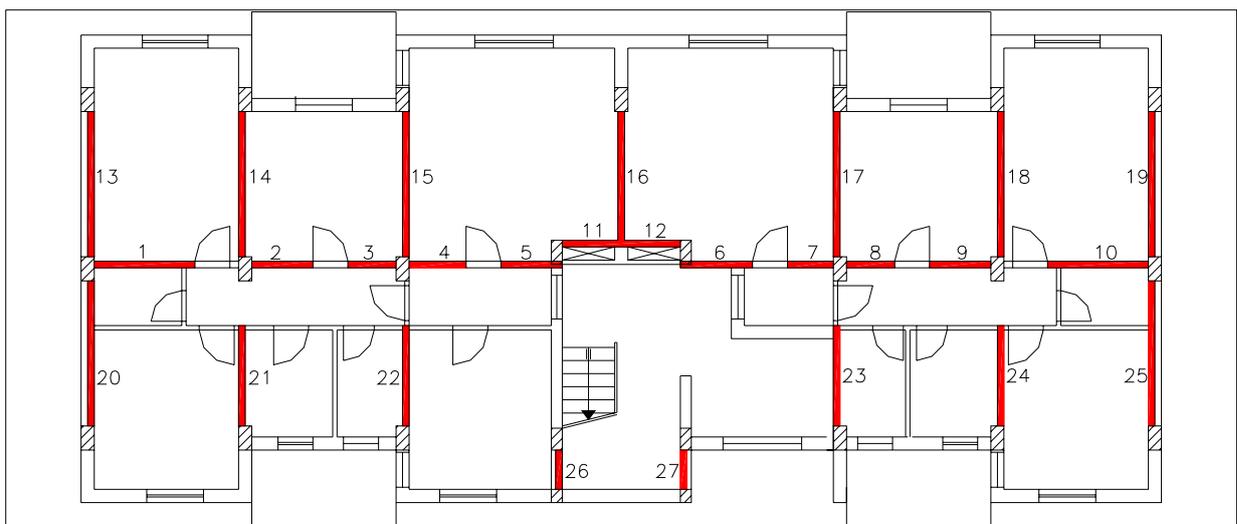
Deformability reduction by reinforced concrete thin walls; first storey
